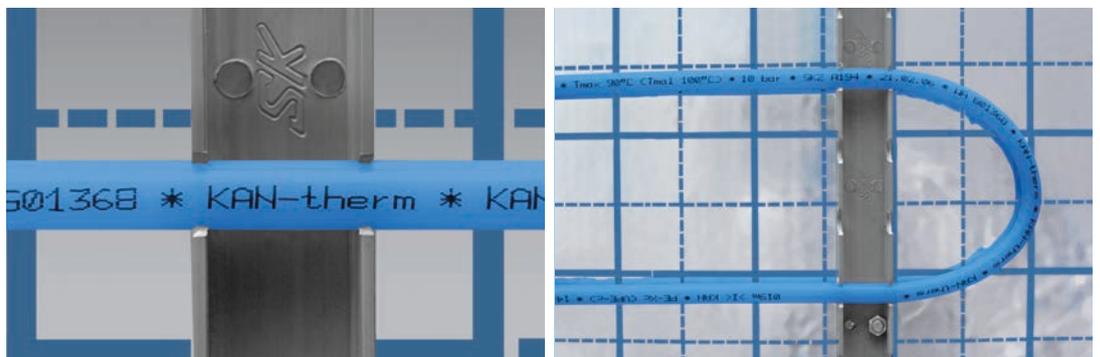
KAN-therm heating pipes mounting in wall heating performed using wet method
